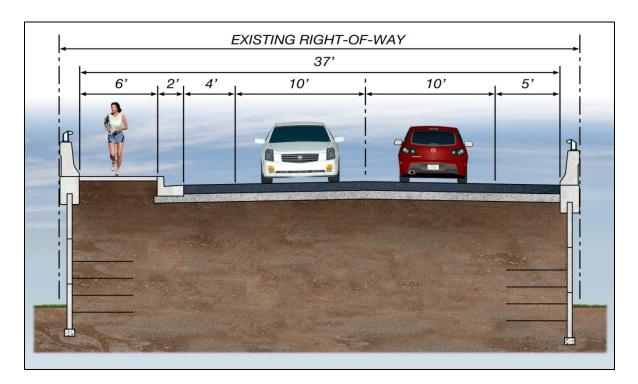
Proposed Roadway Section West of Proposed Fixed Bridge
